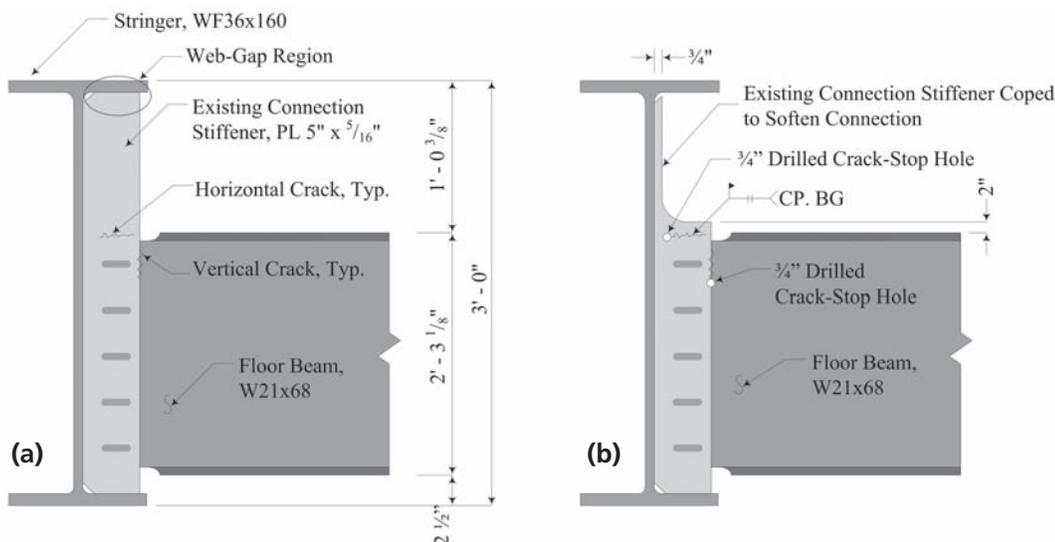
Little Arkansas River Bridge: (a) damaged floor beam to stringer connection; (b) repair performed.
